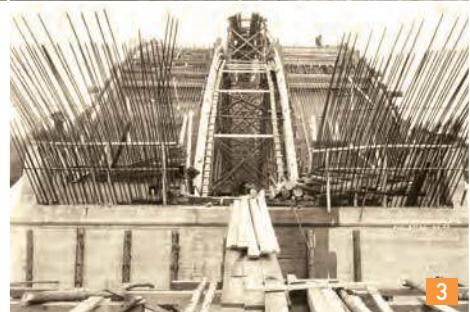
shows the piers prior to the building of the arches, with the Traffic Bridge shown to the left, Figure 3 shows the form-
